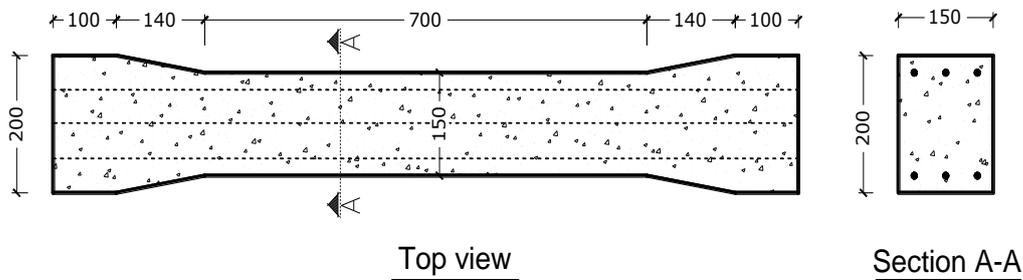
Geometry and reinforcement detail of the test specimens (all dimensions are in mm)
